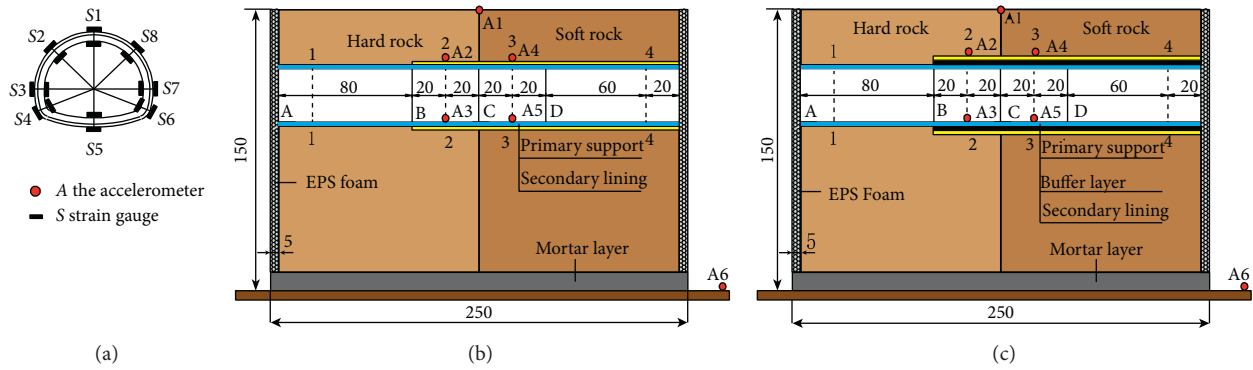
Instrumentation for seismic damage tests: (a) cross-sectional monitoring point, (b) layout of sensors in the longitudinal sections without buffer layer, and (c) layout of sensors in the longitudinal sections with a buffer layer (units: cm).
